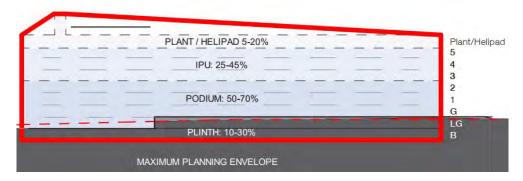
Southeast Elevation of Maximum Planning Envelope
